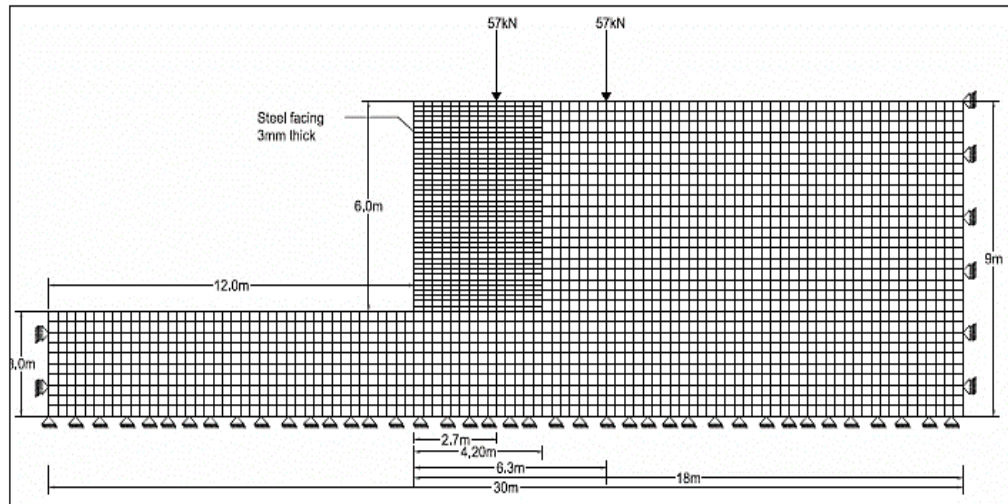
Details of Retaining wall being studied subjected to Point Loads
